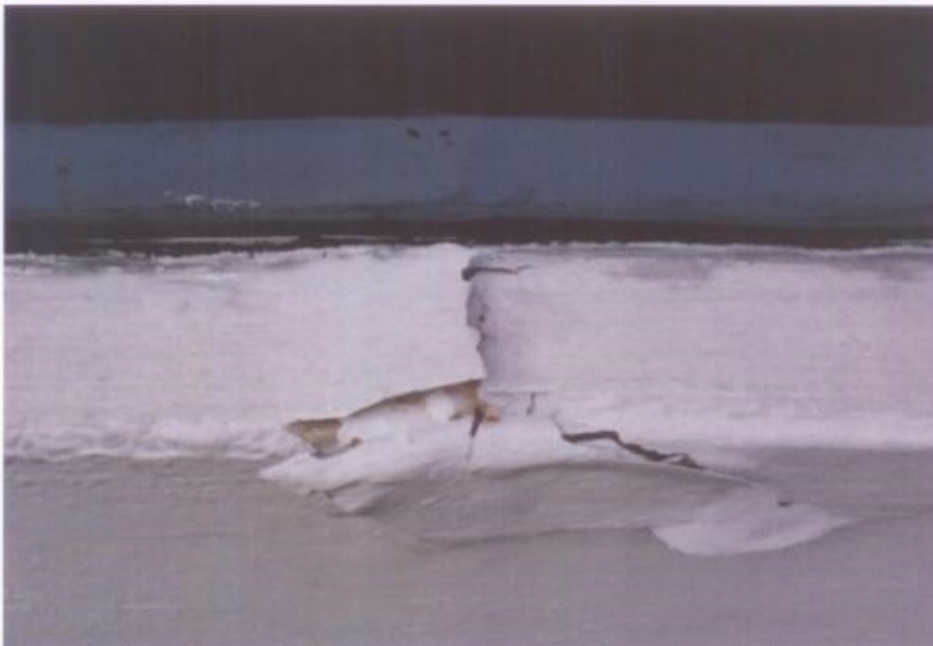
shows a section of the wall at the upper part and at the top surface, was separated into 2. The glass partition erected at the top surface of this wall was however unaffected.
